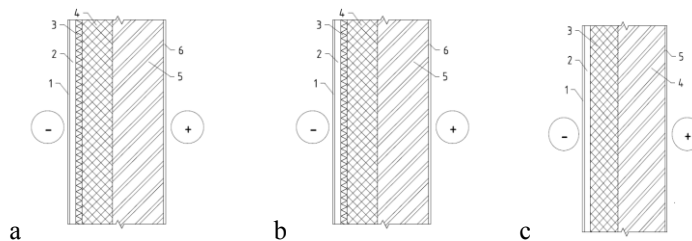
Structural solutions for walls: (a) rock wool; (b) polystyrene foam sheets; (c) spray-applied polyurethane foam: (a) 1 - External finishing layer; 2 - Ventilated air gap, 30 mm; 3 - Wind barrier; 4 - Thermal insulation with PAROC FAS B; 5 - Brick wall; 6 - Finishing layer [4]; (b) 1 - External finishing layer; 2 - Ventilated air gap, 30 mm; 3 - Wind barrier; 4 - Thermal insulation with EPS 70; 5 - Brick wall; 6 - Internal finishing layer [2, 3]; (c) 1 - External finishing layer; 2 - Ventilated air gap, 30 mm; 3 - Polyurethane foam POLIURETAN SPRAY S-303E-W; 4 - Brick wall; 5 - Internal finishing layer [4].
